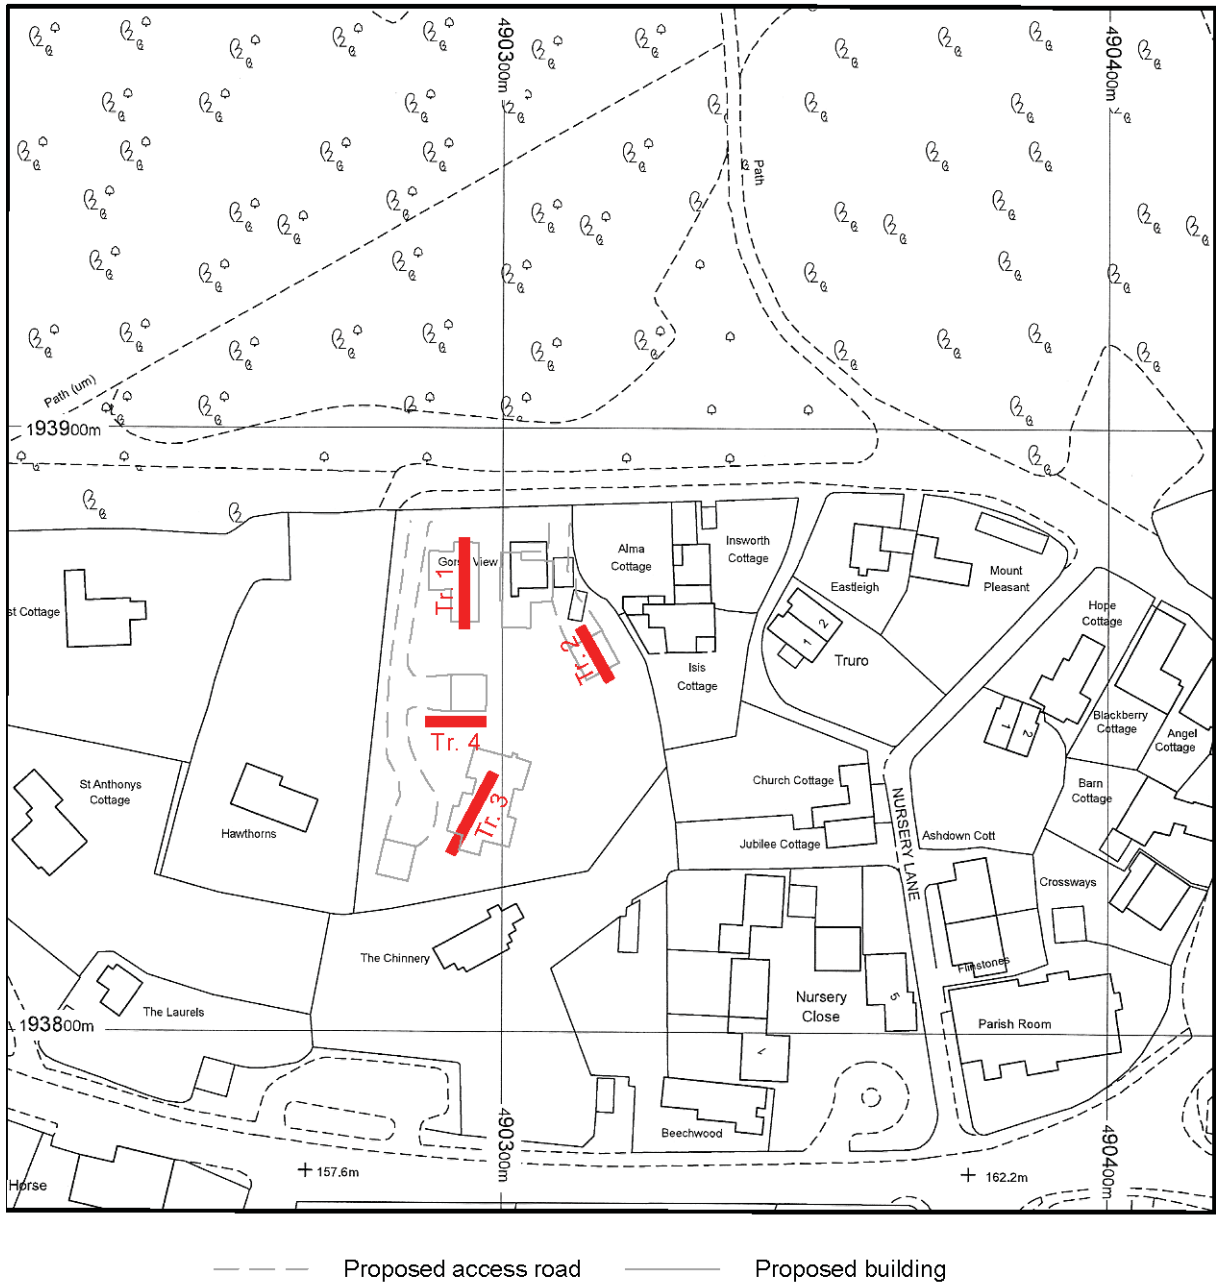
Site plan showing actual trench locations (scale 1:1250)
